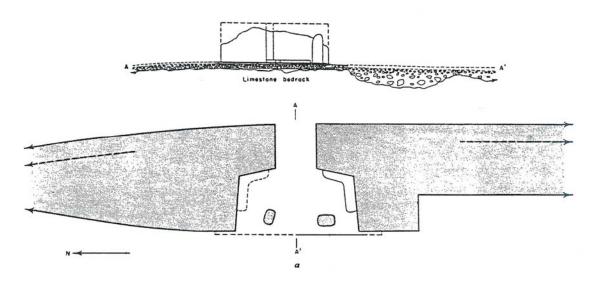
Plan and cross section drawings of Gate T (modified after Shook 1952: Figure 2a).
